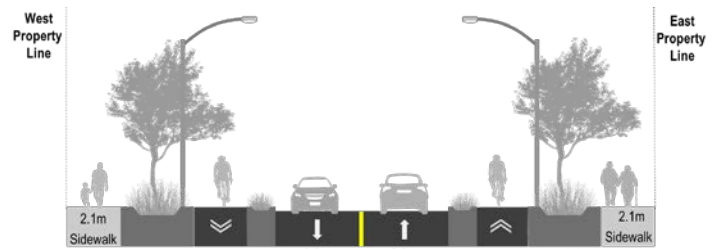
Illustrative rendering looking north on Gordon Avenue toward Sheppard Avenue East
